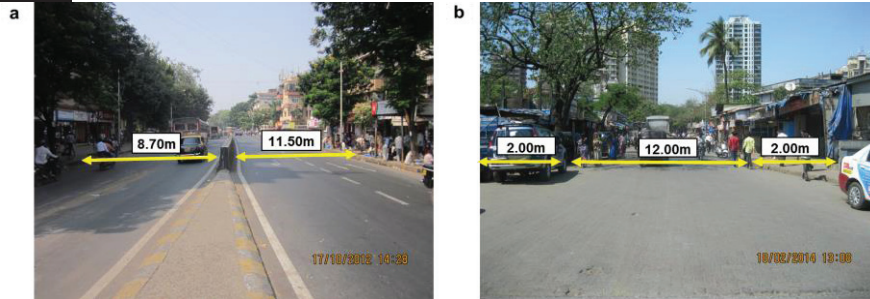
(a) L.J. Road; (b) Dubey Road.
